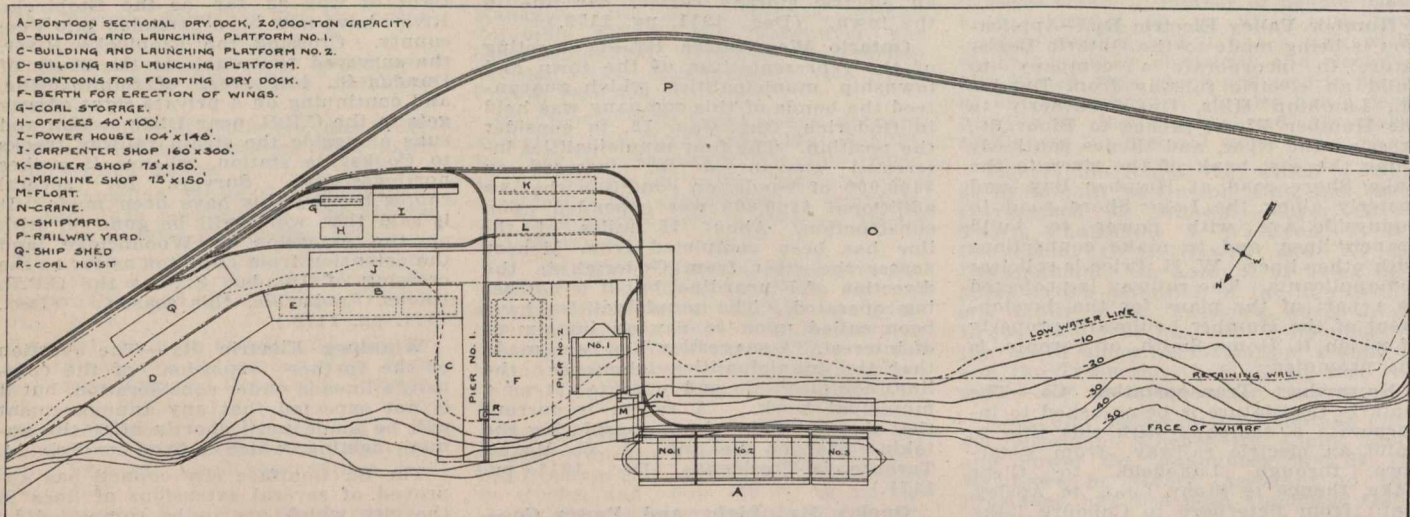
Location of Drydock, Ship repair and Shipbuilding Plant, Prince Rupert.
